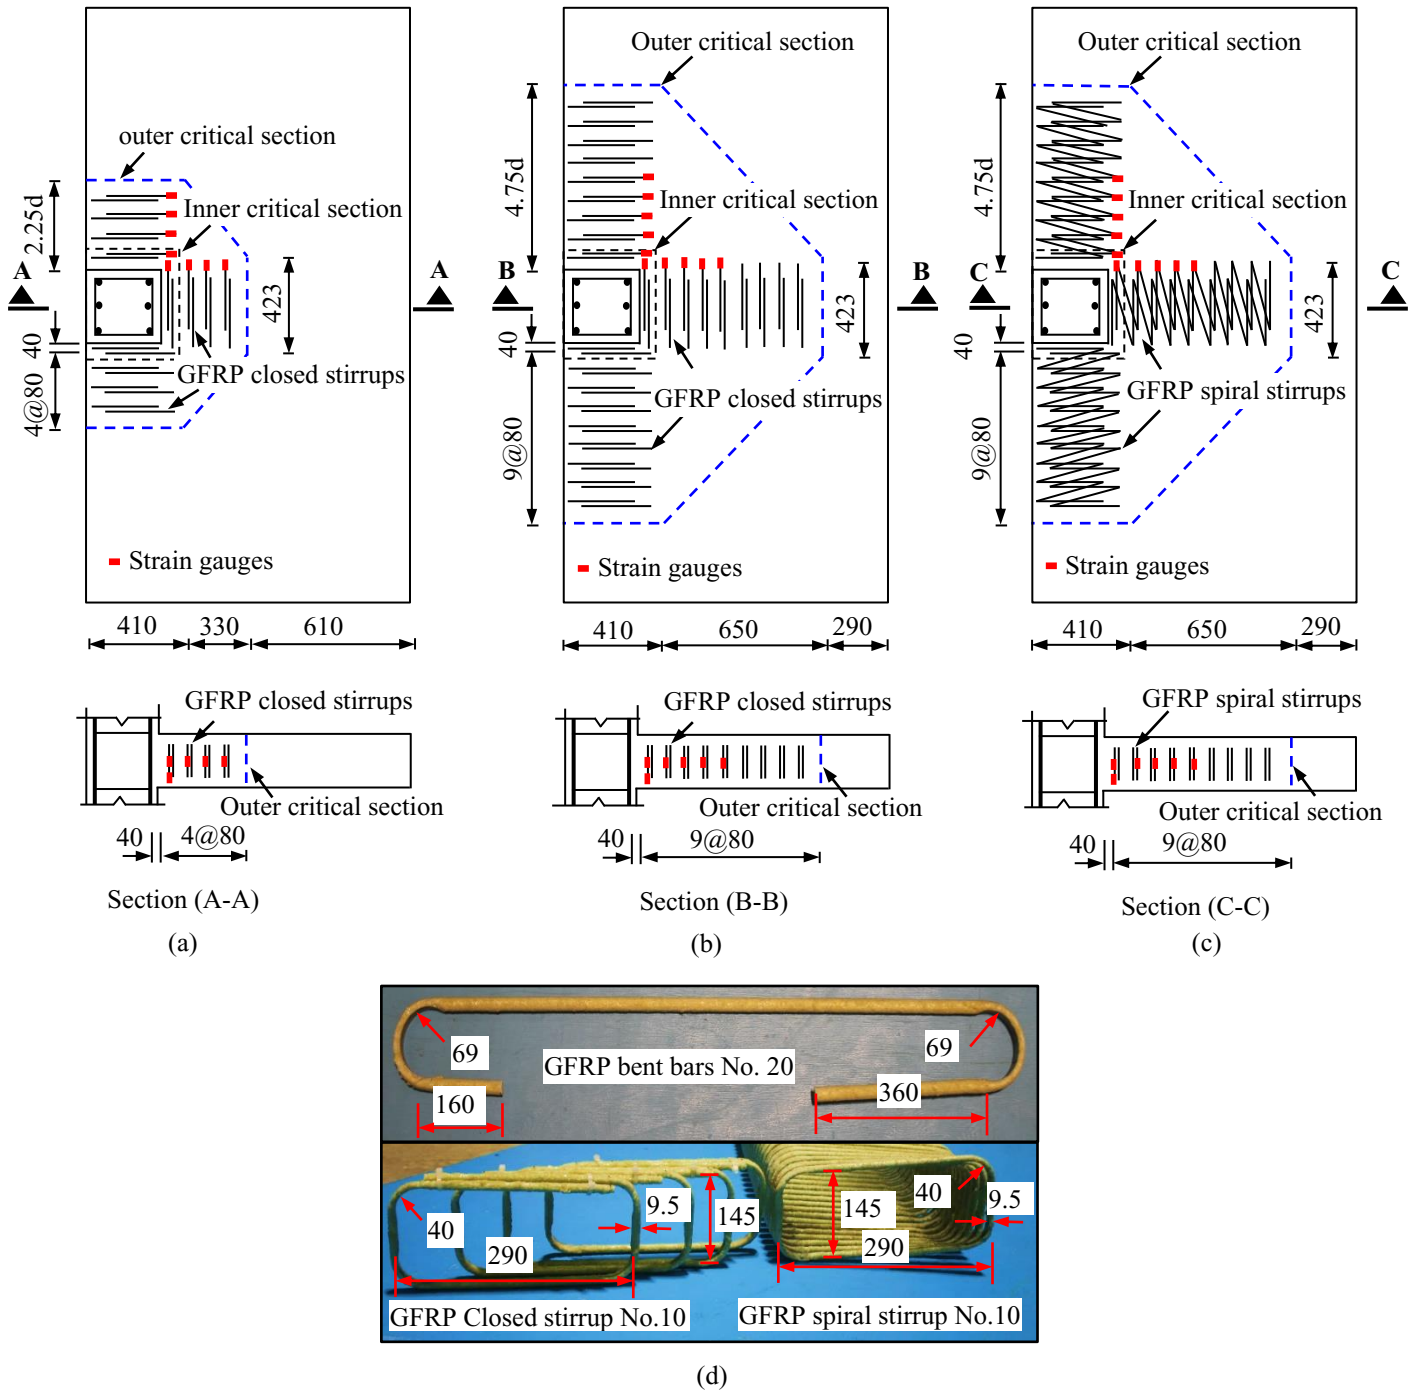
Shear stirrups configuration: (a) Closed stirrups arrangement (G-CS-1.75d); (b) Closed stirrups arrangement (G-CS-4.25d); (c) Spiral stirrups arrangement (G-SS-4.25d); and (d) Typical dimensions of bent bars and stirrups (Note: 1 mm = 0.0394 in.)
